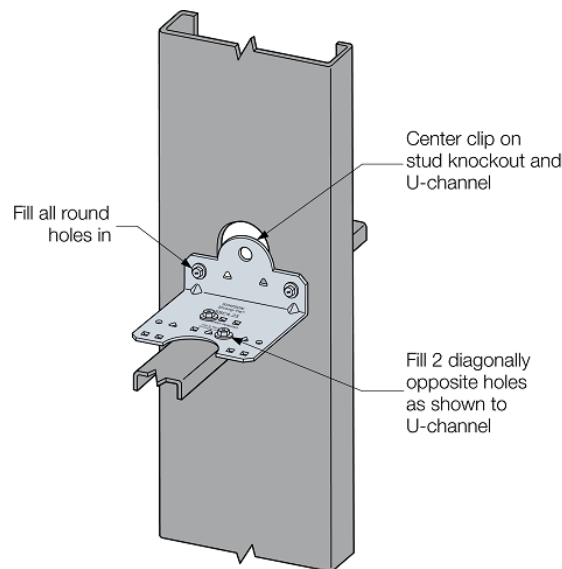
F—SCC CONNECTOR U-CHANNEL WALL BRIDGING APPLICATION INSTALLATION DETAILS
